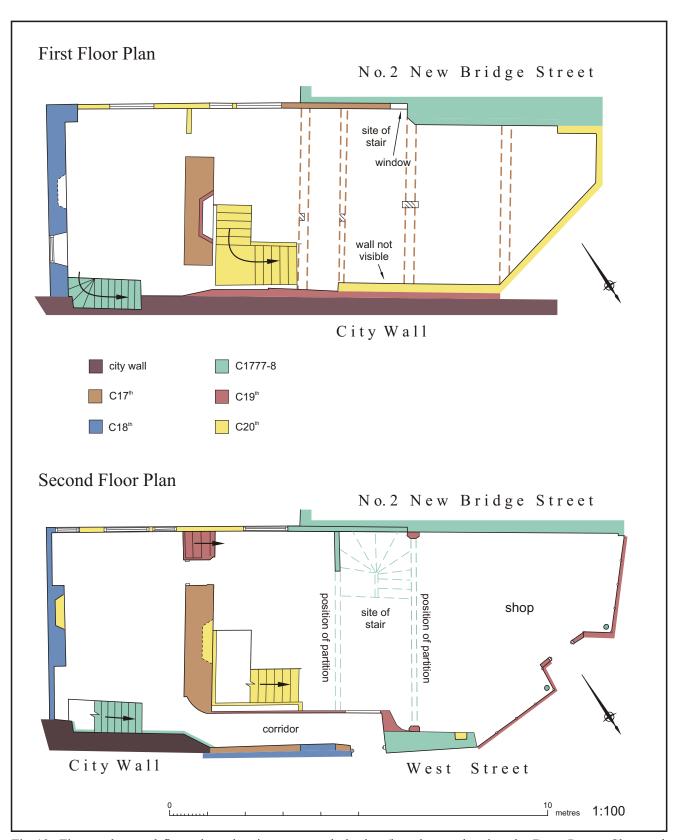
First- and second-floor plans showing suggested phasing (based upon drawings by Drew Pearce Chartered Surveyors).
